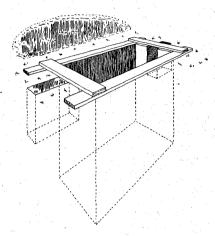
A good method of outlining a septic tank excavation on the ground surface.
